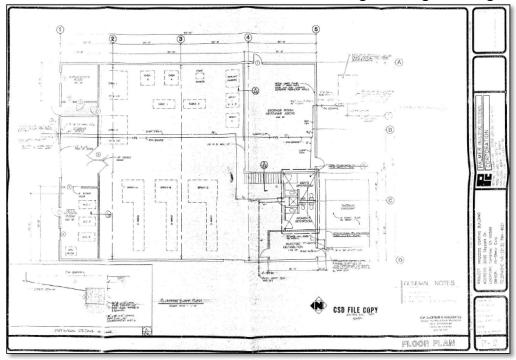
1992 Floor Plan for the Process Coating Building Showing Drywell Detail
